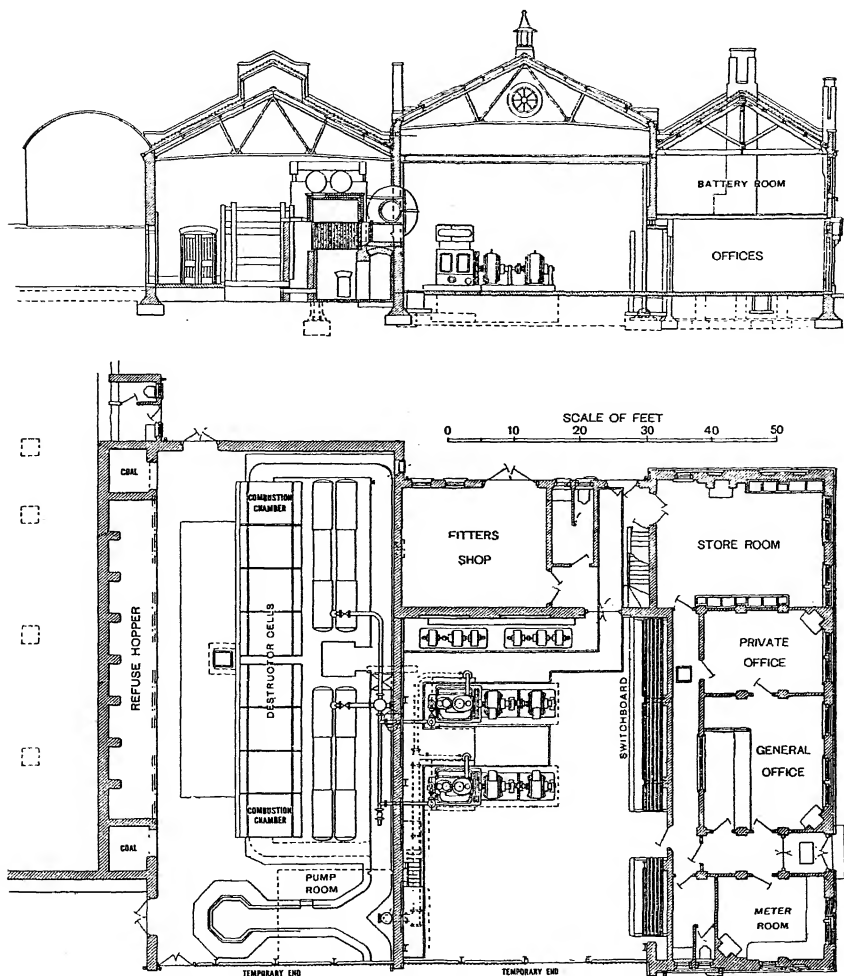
Heenan's Front-Fed Destructor at St Albans. Cross-section and plan.
